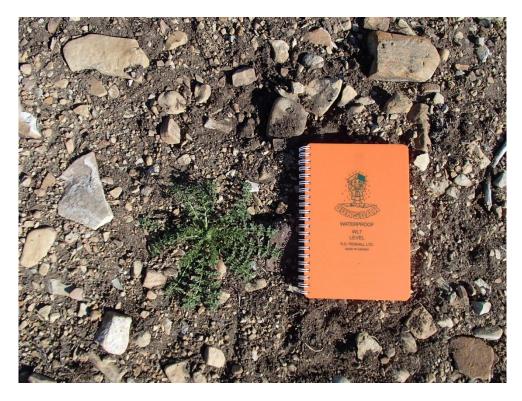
Tier II Disposal Facility – low spot from construction activities on landfill. Picture P8130026 ↑
